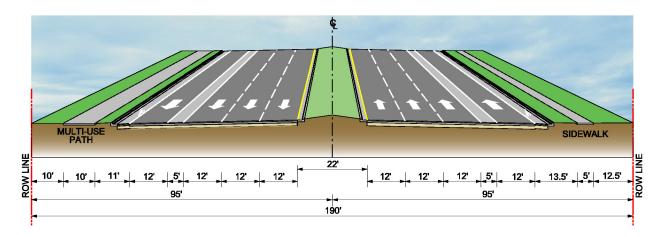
SIX-LANE DIVIDED URBAN TYPICAL SECTION BOYETTE ROAD TO FUTURE MCKENDREE ROAD REALIGNMENT
